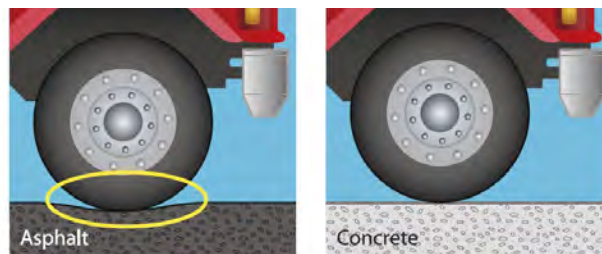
Exaggerated depiction of a truck tyre deflecting an asphalt road (left) but not a concrete road (right). Image: ACPA.
